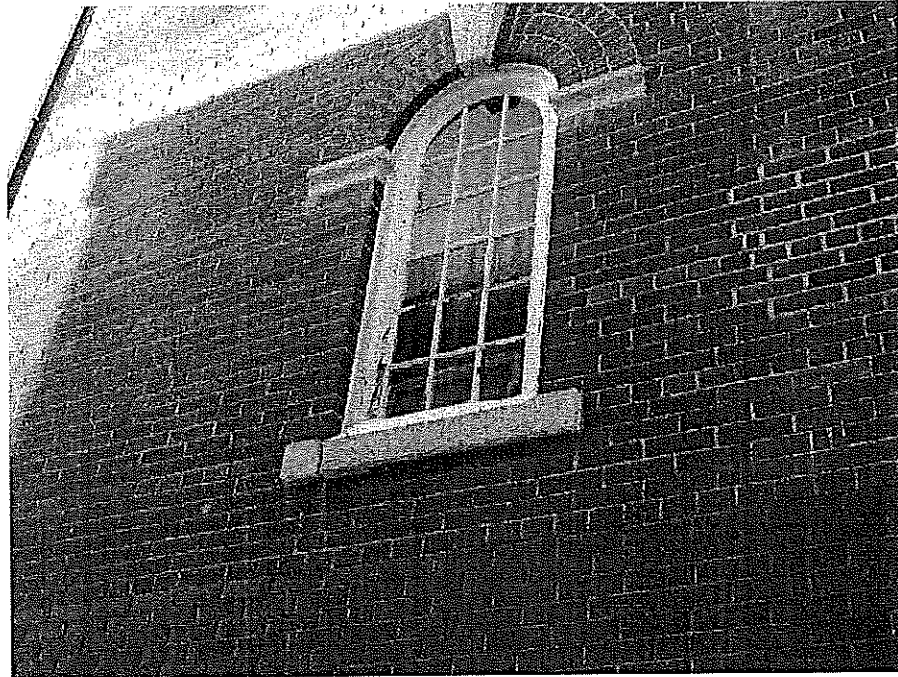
South face of Chapel showing severely cracked Tyndall Stone sill
